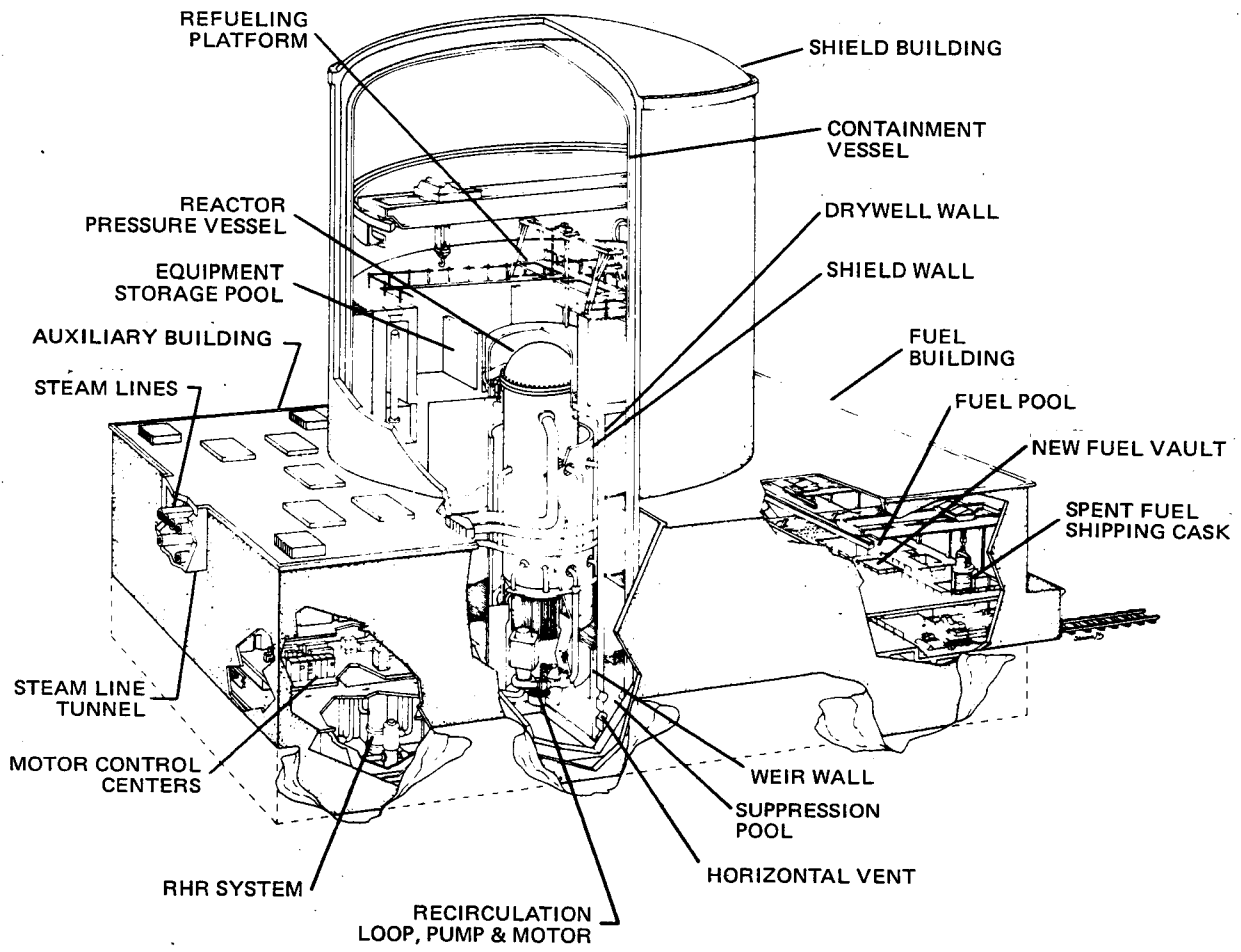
Reactor Building, Fuel Building, and Auxiliary Building
